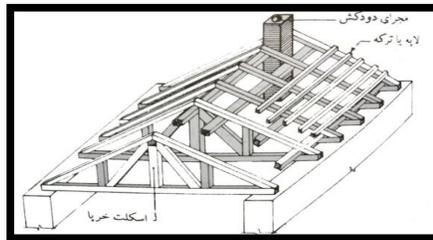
Detailed execution of wooden skeleton of roof in Madani's House from Qajar Period, Amol, Mazandaran, Iran.
